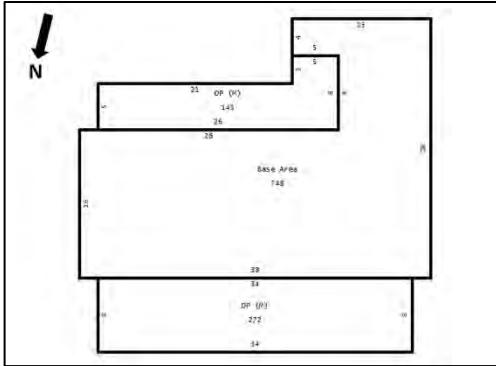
Image of the floor plan sketch of the house from property tax records (source: Henderson County tax records, 2005 sketch)
